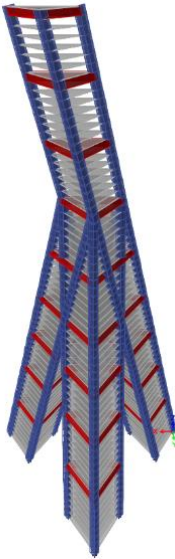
3 Mega columns with belt wall, 270 m high
